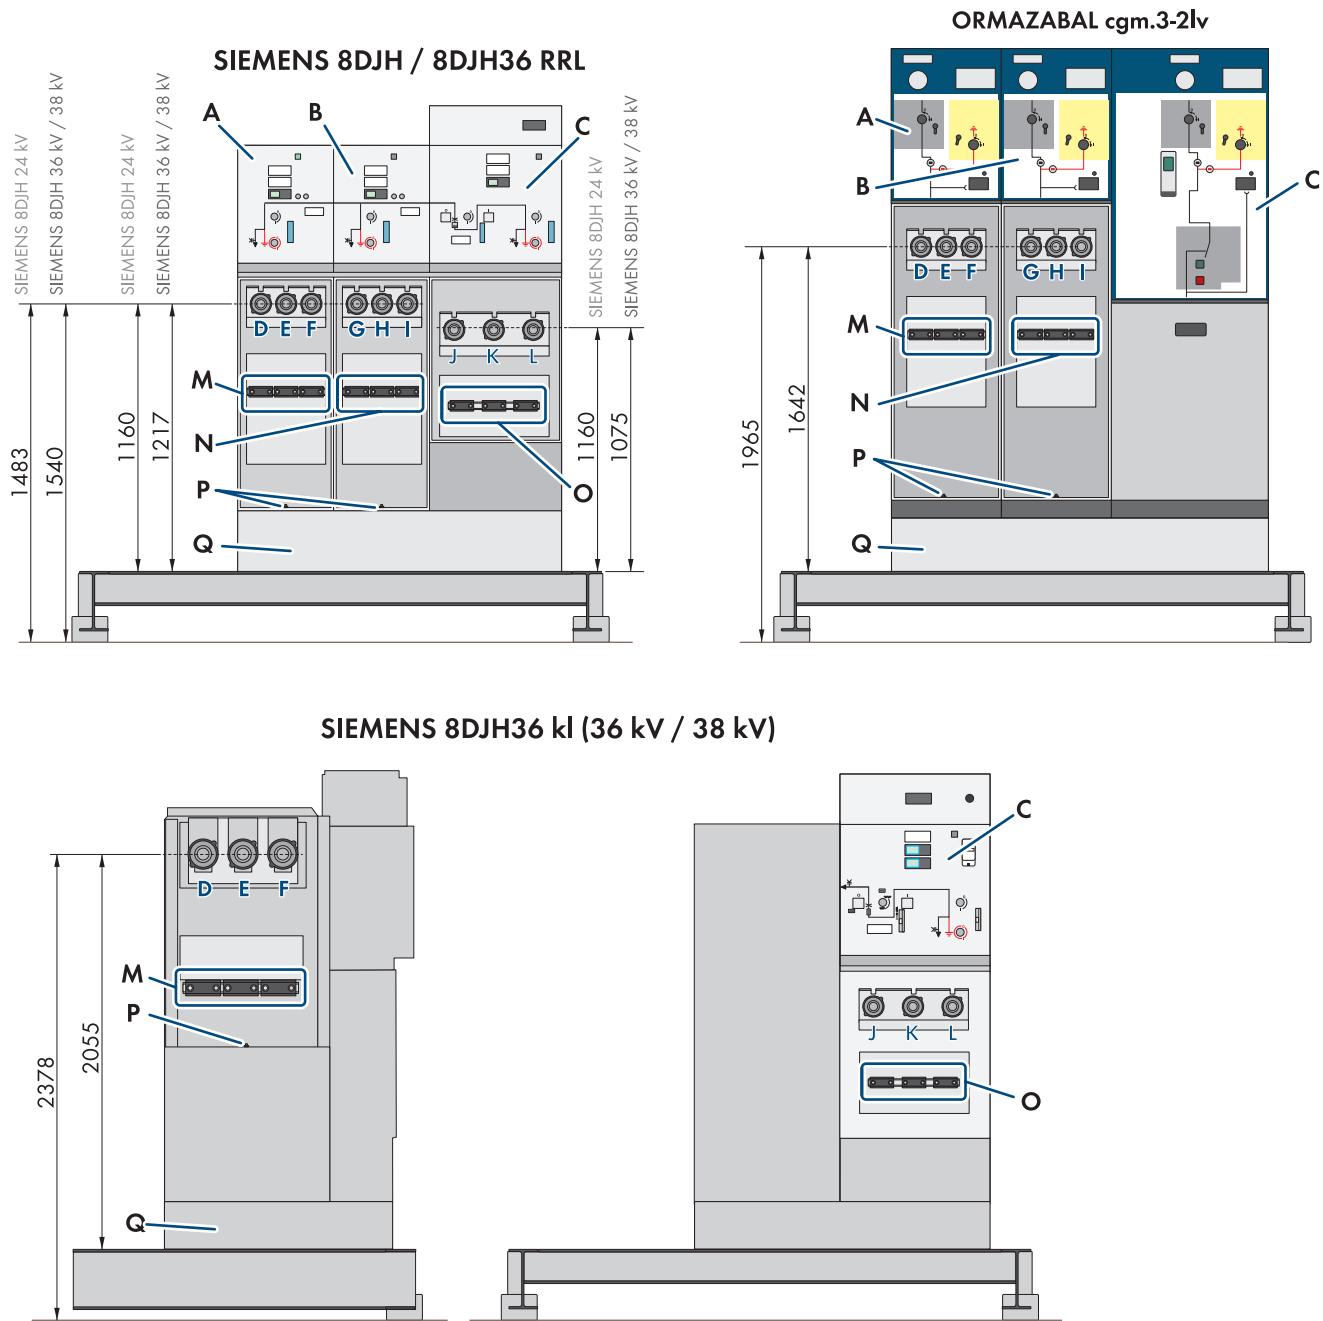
Connection area of medium-voltage switchgear (example) (Dimensions in mm)
